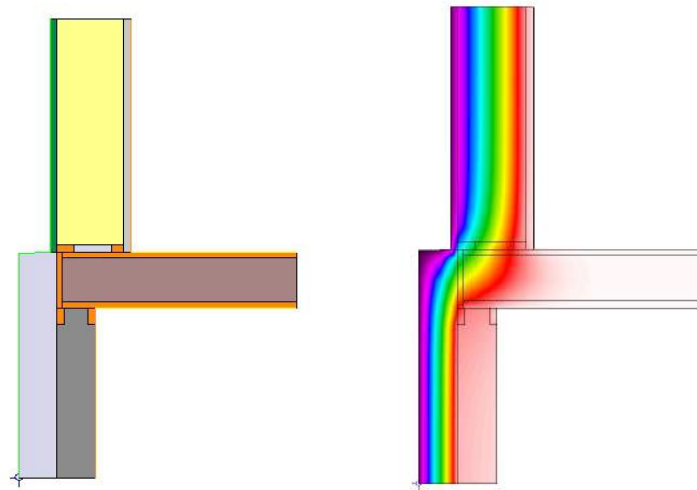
A Typical Straw Bale to Foundation Detail Where Insulation is Not Continuous (Magwood & Walker, 2001).
